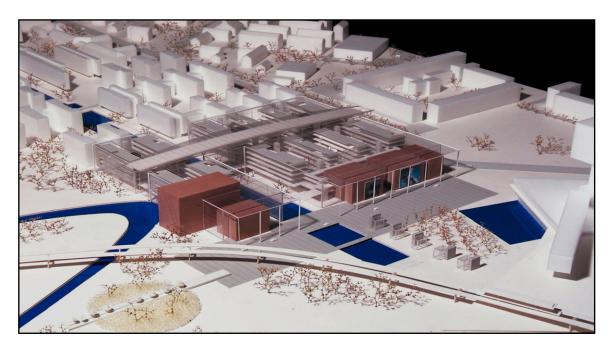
Model photo of the winning master plan – seen from south-west
